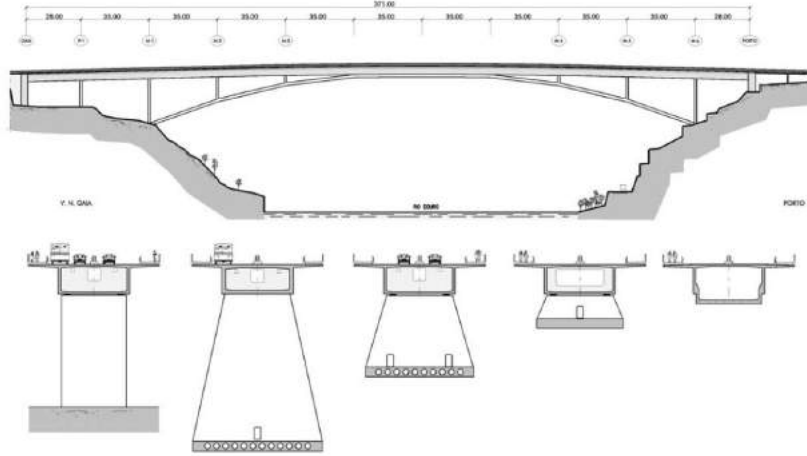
Elevation and cross-sections of the Infante Dom Enrique Bridge.
